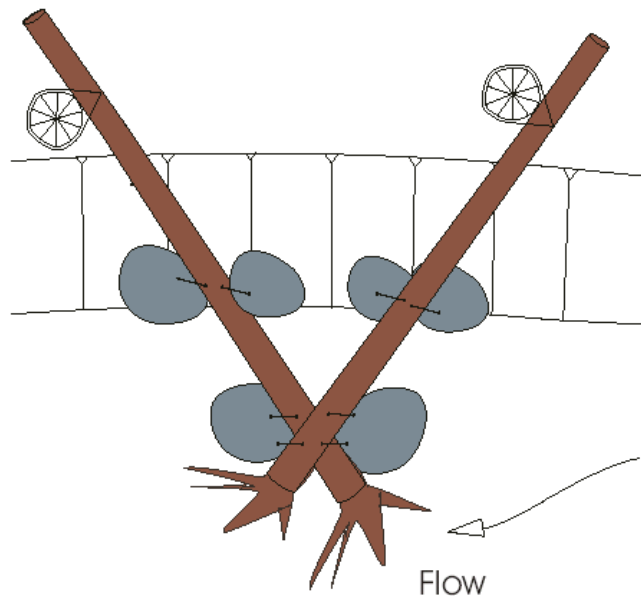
Conceptual ballasted triangular rootwad structure without ramp logs.
